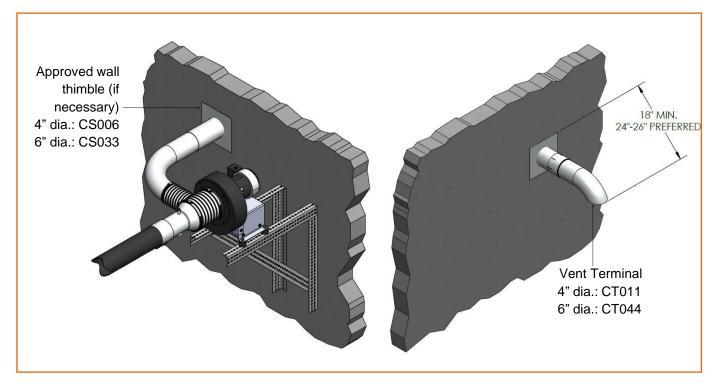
Side Wall Mounting - Recommended Venting (Horizontal)
